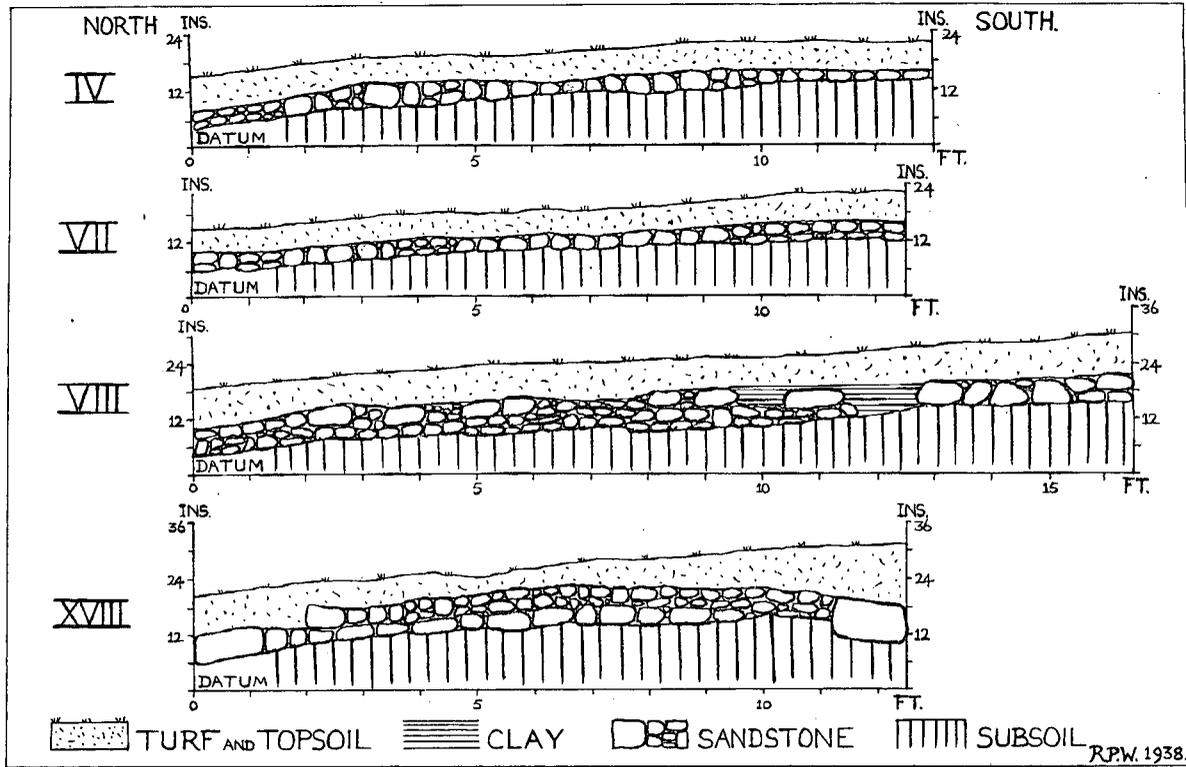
CROSS-SECTIONS OF THE STANEGATE AT WALWICK GRANGE.
